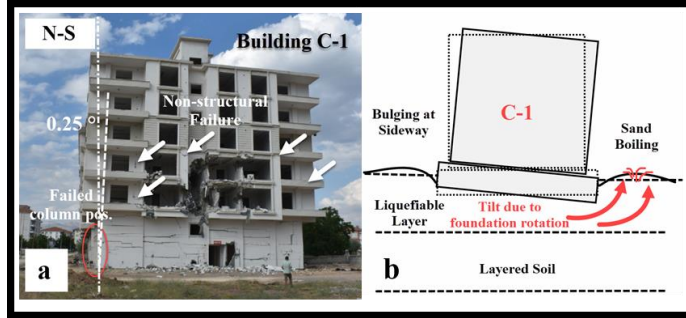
Building C-1 after the 06 FEB 2023 earthquakes, a) photo and b) schematic view of tilt in N-S direction due to geotechnical and structural damages (37.78037° , 37.6284°)
